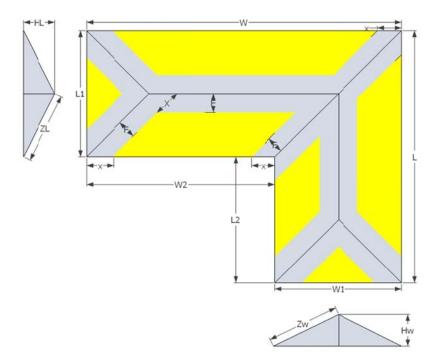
Potential solar zones for an L-shaped building with hip roofs
